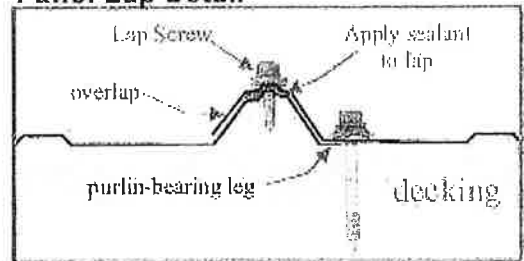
Butyl tape or caulk is required when the roof pitch is as low as 2/12 or 3/12, with lap screws applied every 2 feet to keep water from overflowing the lap. On pitches greater than 3/12, lap screws and butyl tape are optional. For more details on screws, see pg. 6.
